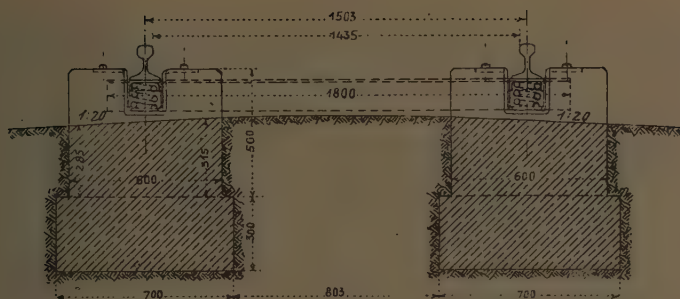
Cross section of the new system of permanent way invented by the late Dr Wirth and installed experimentally on the Austrian Federal Railways.
